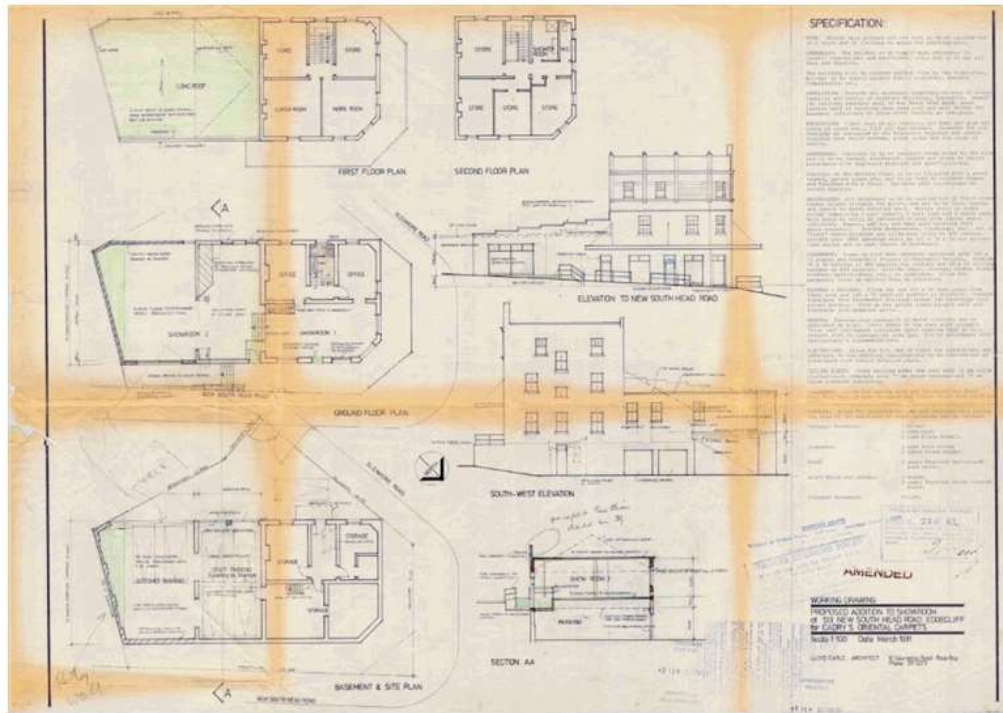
BA419/81 which approved works to the ground floor level showroom.
